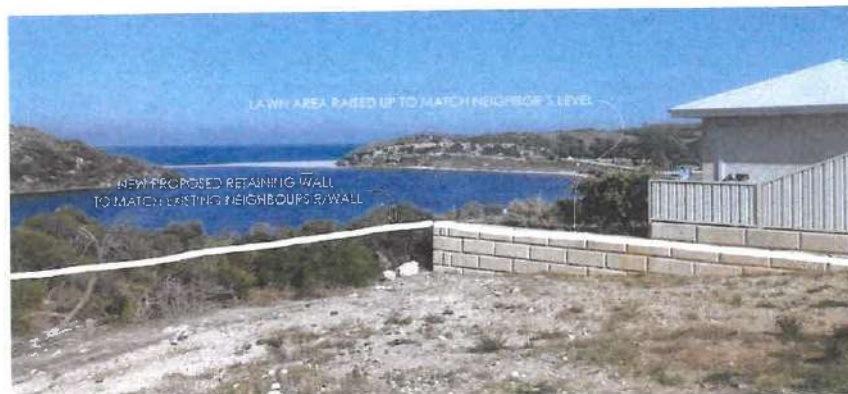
Proposed retaining wall height to south/west boundary in relation to neighbour
